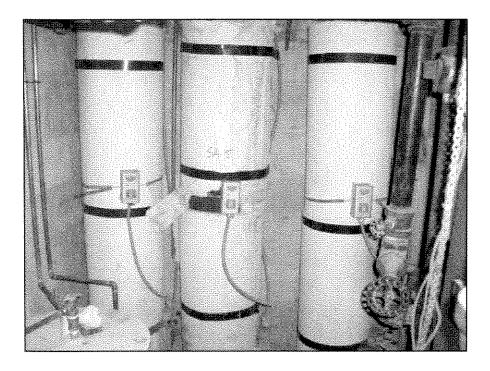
Friable asbestos boiler insulation, basement 138 Bank Street.
